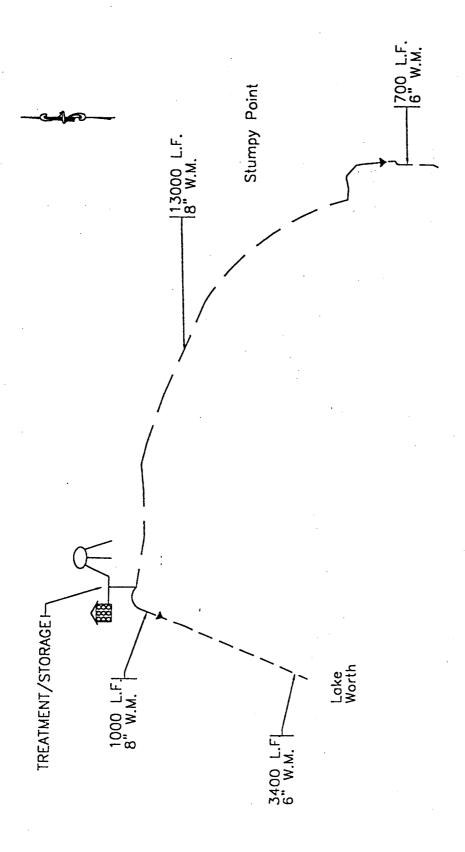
SYSTEM LAYOUT WITH FIRE PROTECTION AND UTILIZATION OF THE SITE NEAR THE N.C. HWY 264 AND SR 1100 INTERSECTION.
